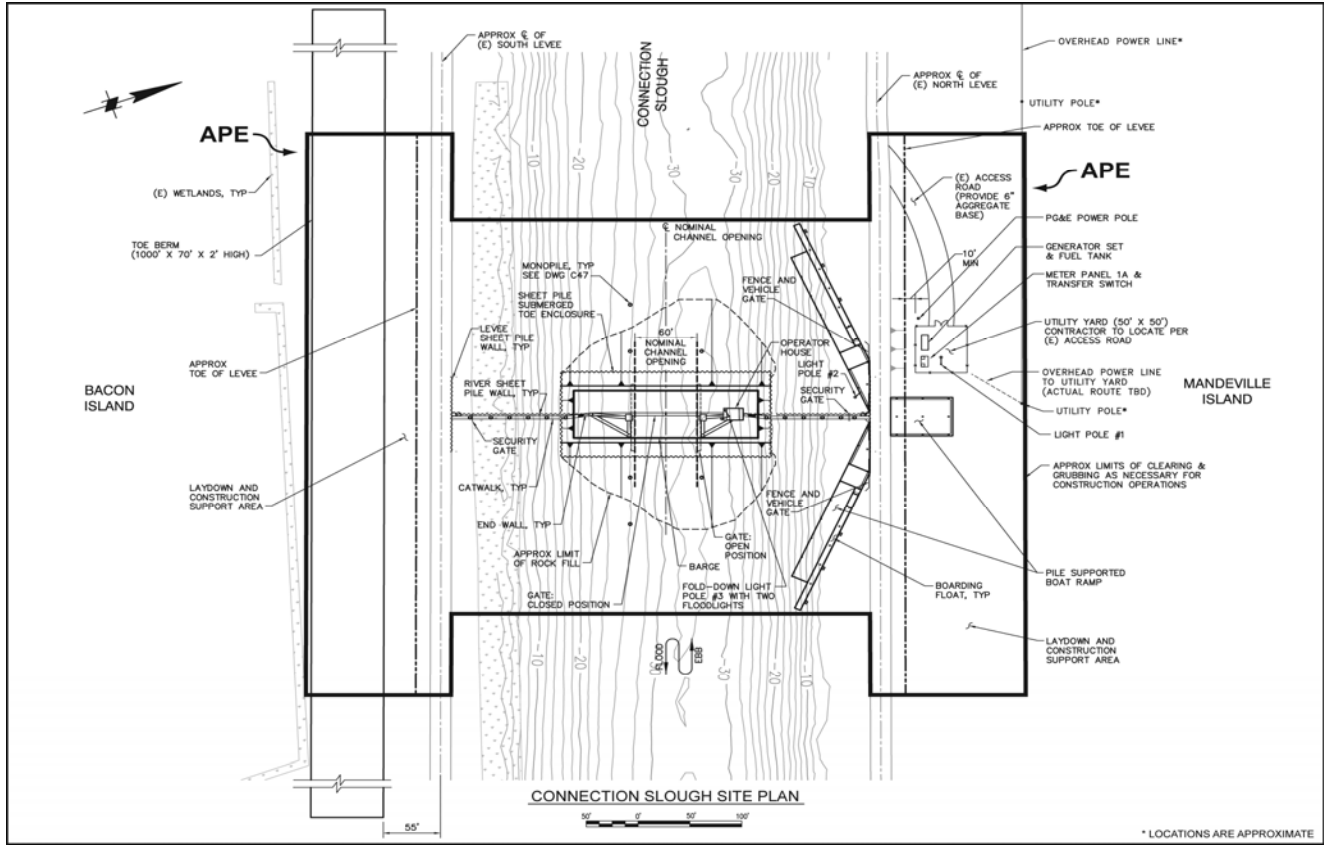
Connection Slough Site Plan View and Area of Potential Effects
